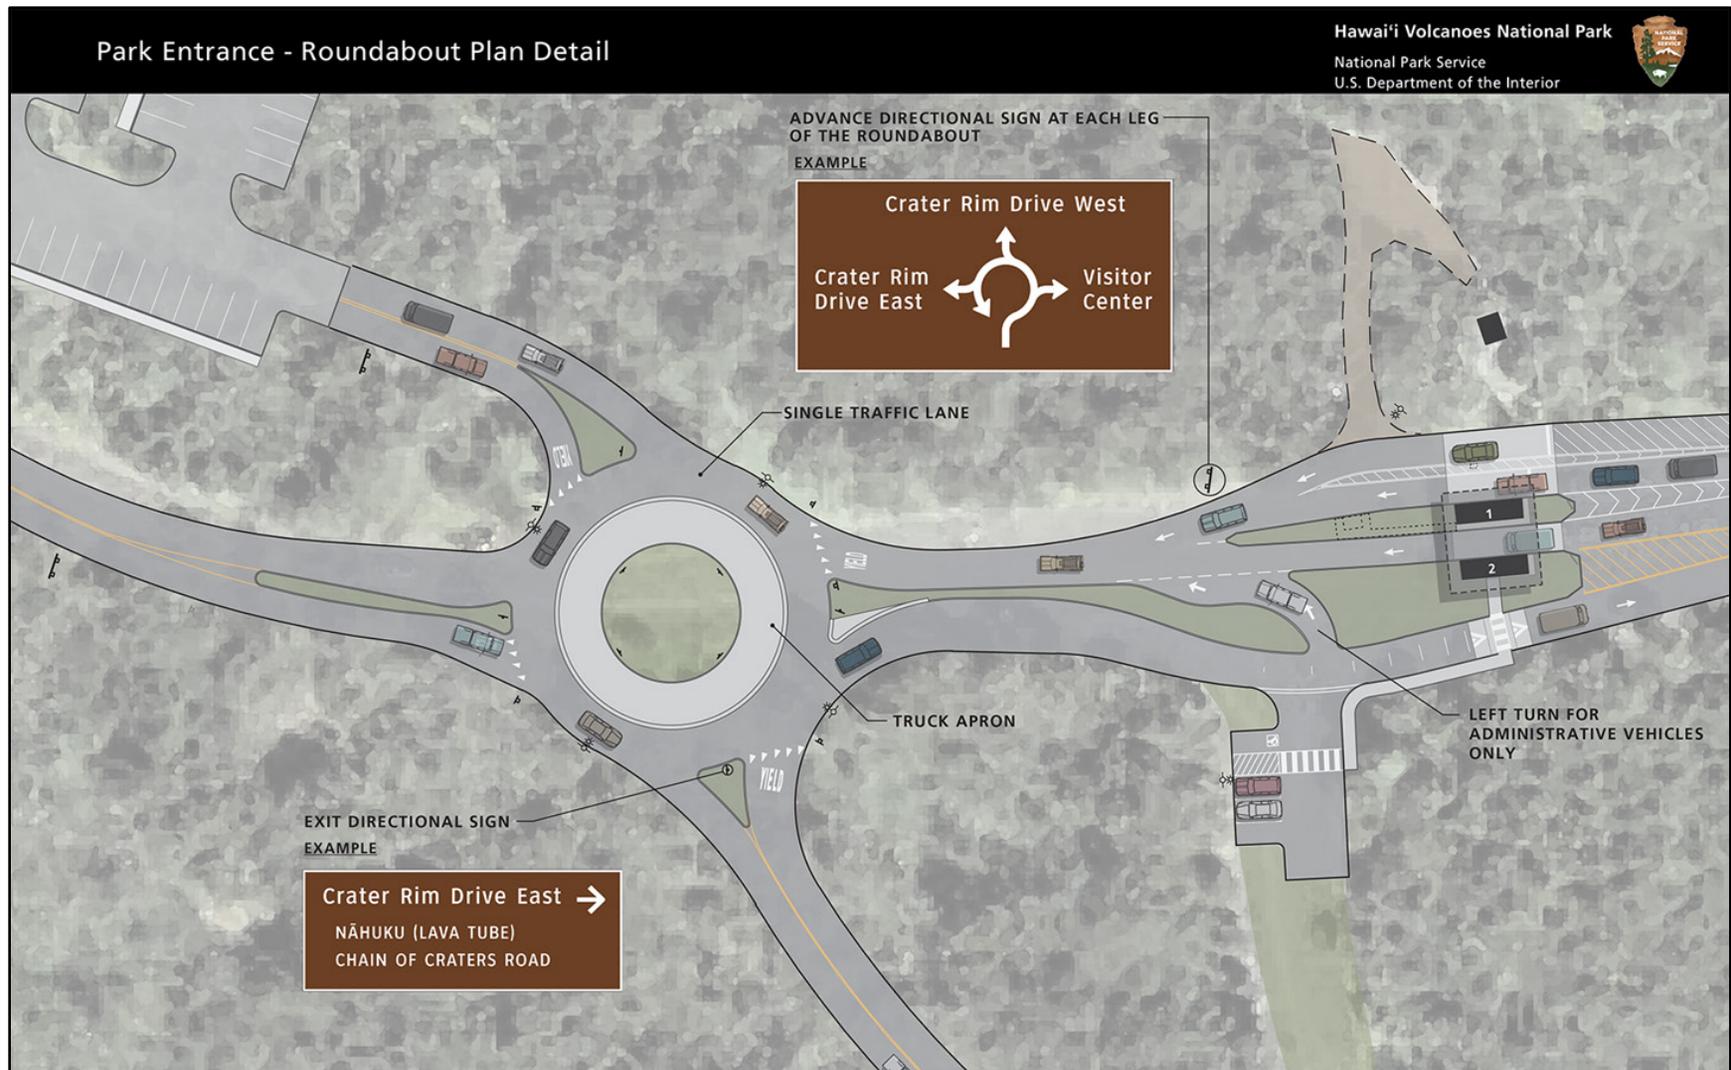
Proposed Action – Park Entrance Roundabout Plan Detail
